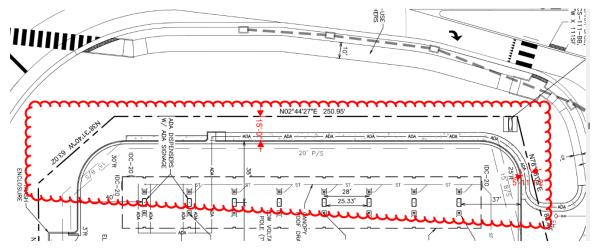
Proposed reduced parking lot setback areas (plan north to the right).
